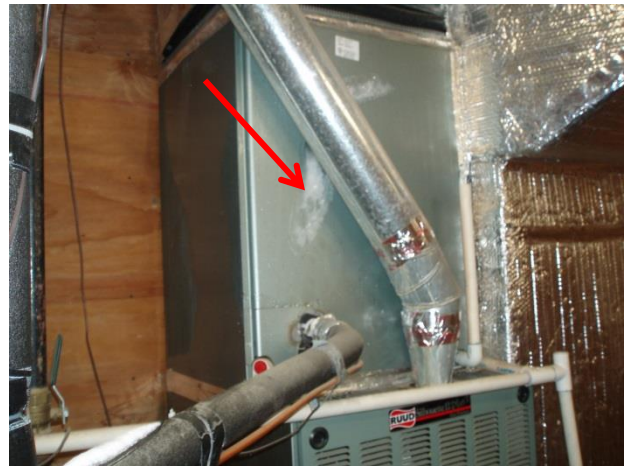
Ice forming on the exterior of the cooling coil section of furnace F-4.
